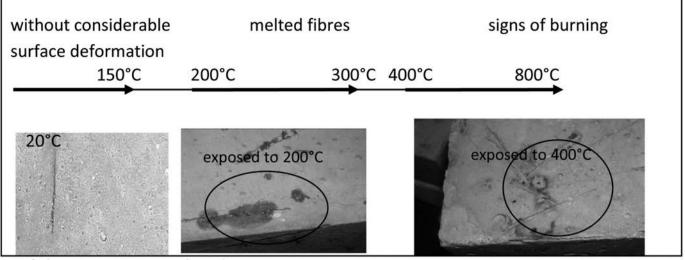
Concrete specimens with macro fiber reinforced concrete
